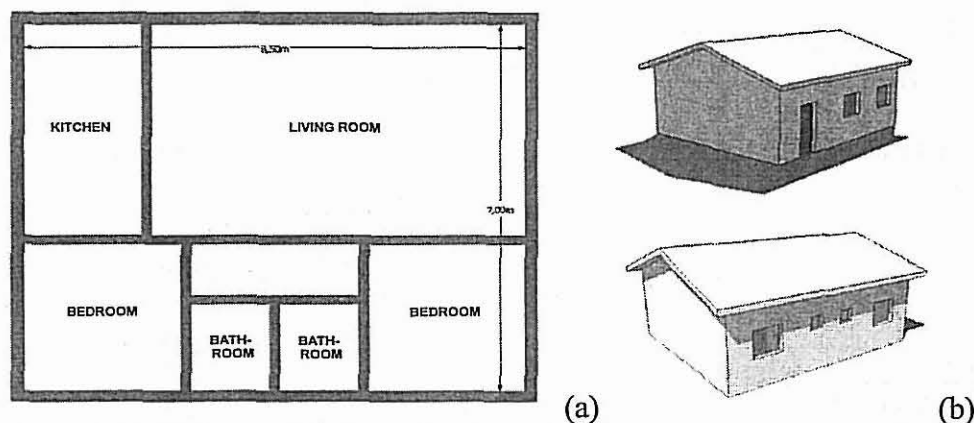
Building model: floor plan (a) and geometrical representations (b).
